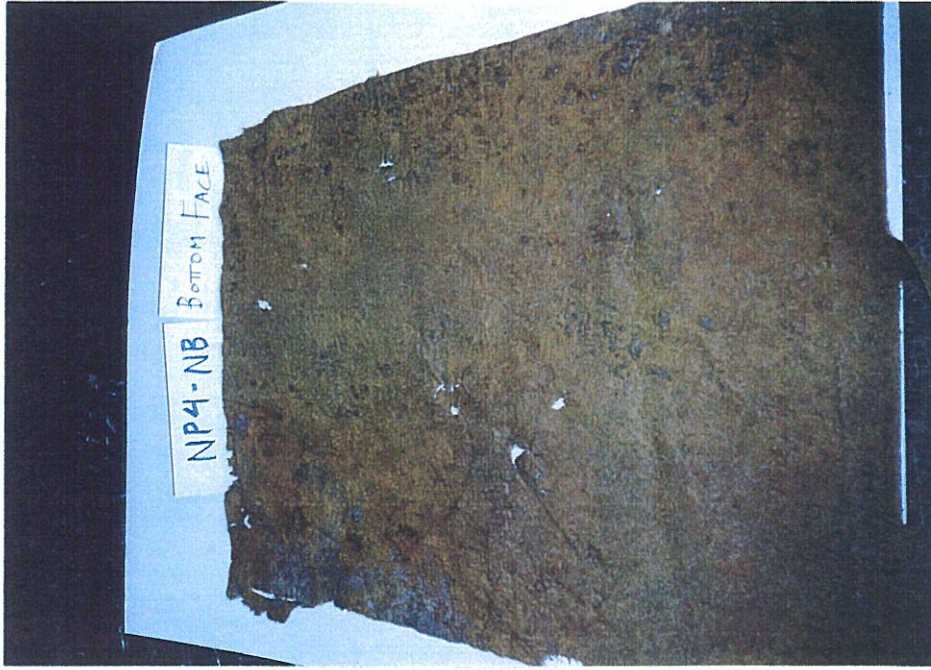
Bottom face of NP4-NB geotextile, lab. photo.
